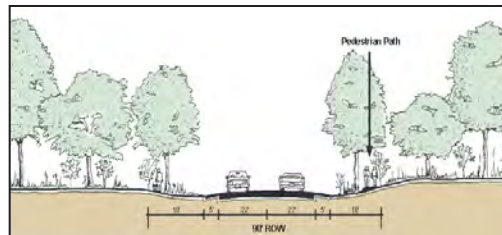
One possible road cross section design for Newman Road. The section includes two driving lanes, drainage way and pedestrian paths.
